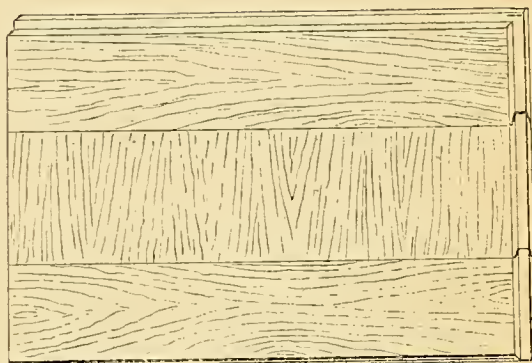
SHUTTER OF PIECES TONGUED AND GROOVED TOGETHER.
